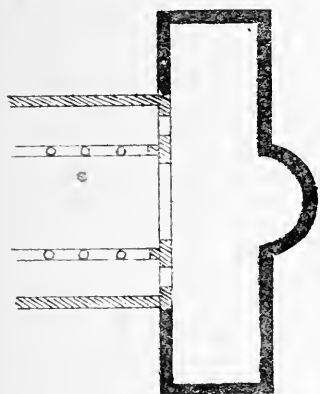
Plan of early Church of St. Denis, showing T form. (No scale.)
